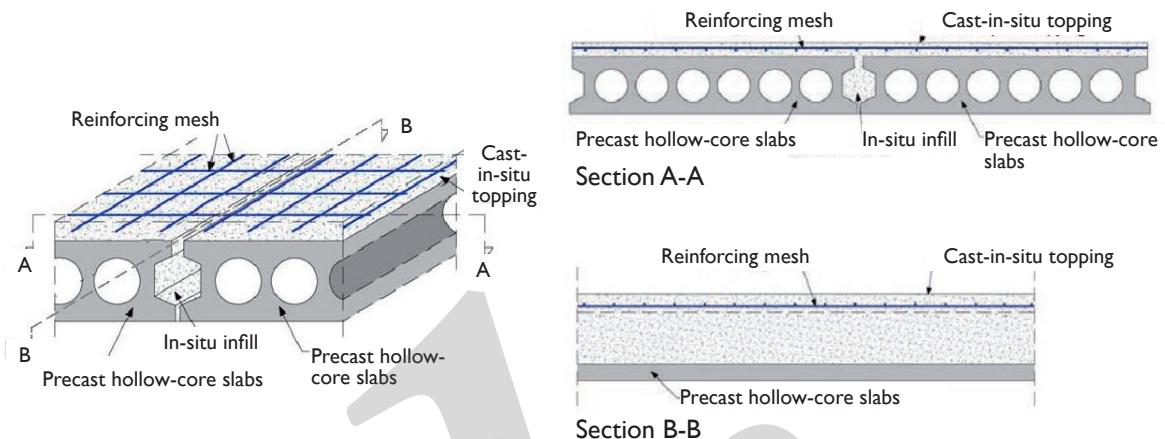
Typical details for topped hollow-core slab to ensure full transfer of longitudinal shear across interface of precast units
